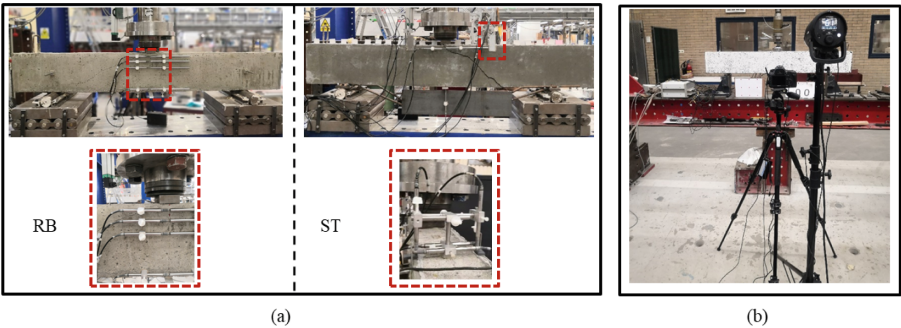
Measurement system: (a) LVDT configuration, (b) DIC setup.
